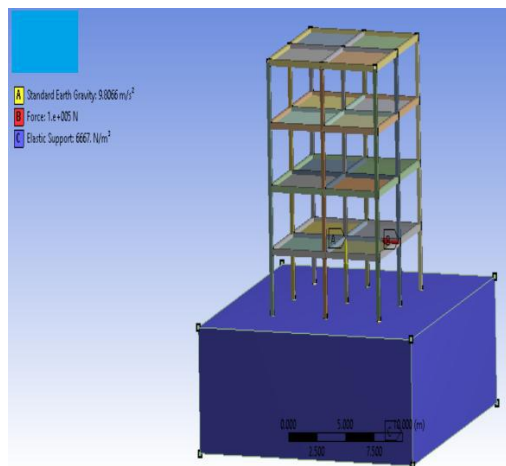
Extruded model of the building frame resting on piles in contact with the soil
